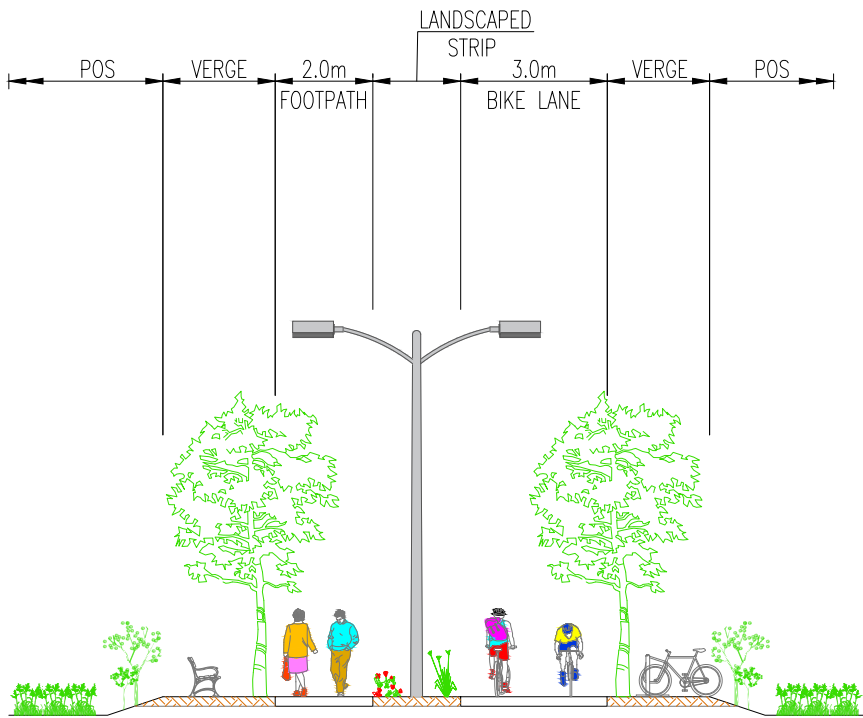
CROSS SECTION LINK ADJOINING POS BOTH SIDES
